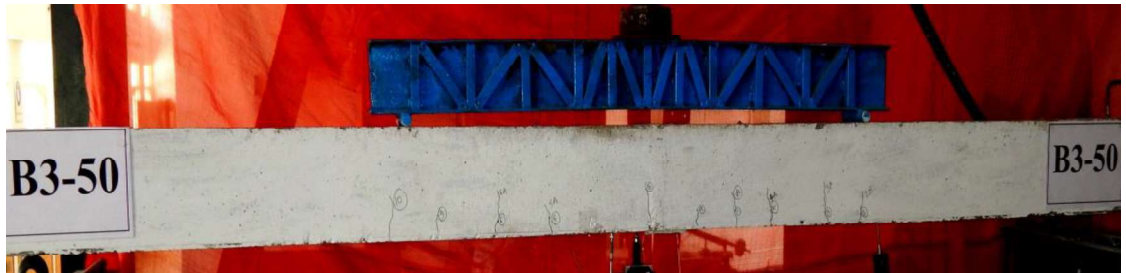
4 Crack patterns of beam B3-50 when specimen was loaded upto 5kN.
